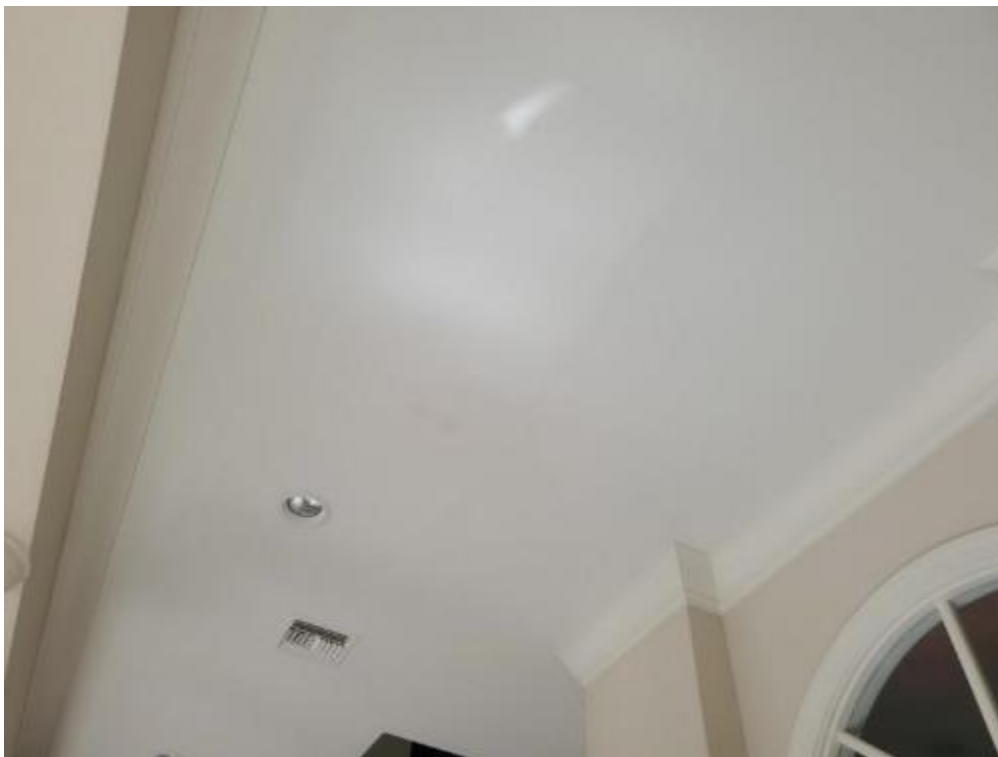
Dark brown stains were on the first story wine room ceiling.
